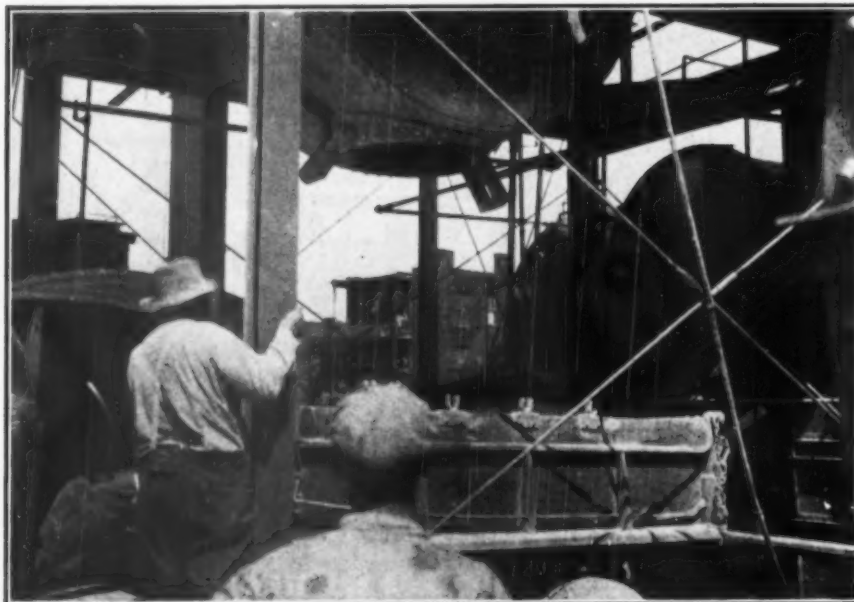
Discharging 5-Ton Batch from Drum Into Truck
